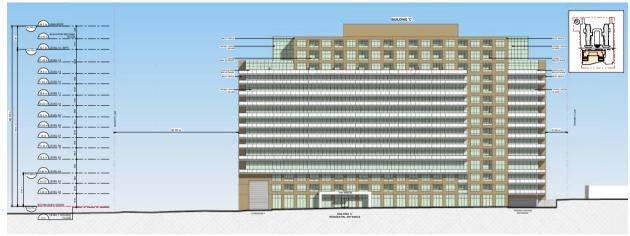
East Elevation (Prepared by IBI Architects Inc.)
